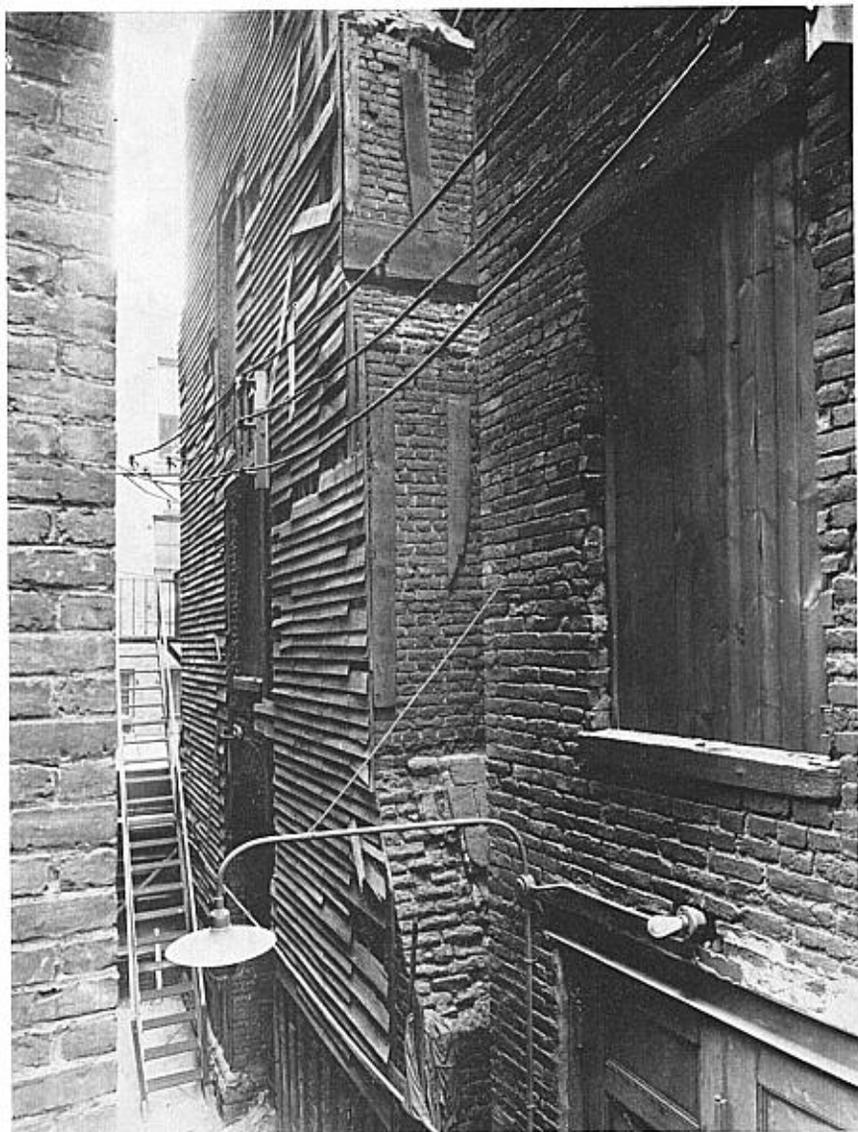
FIG. I. NORTH WALL VIEWED FROM THE WEST
